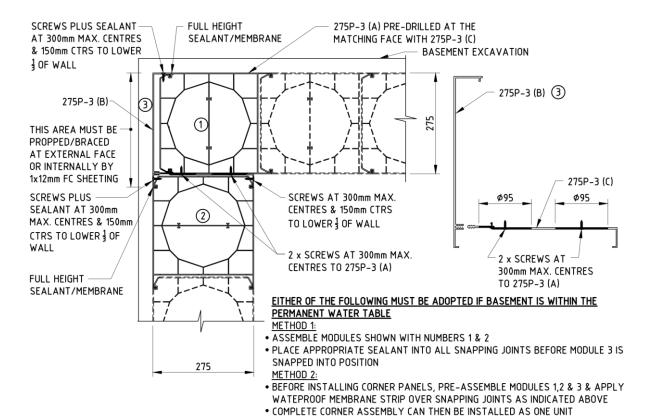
275 P3 DINCEL WALL CORNER & JUNCTION LAYOUTS
